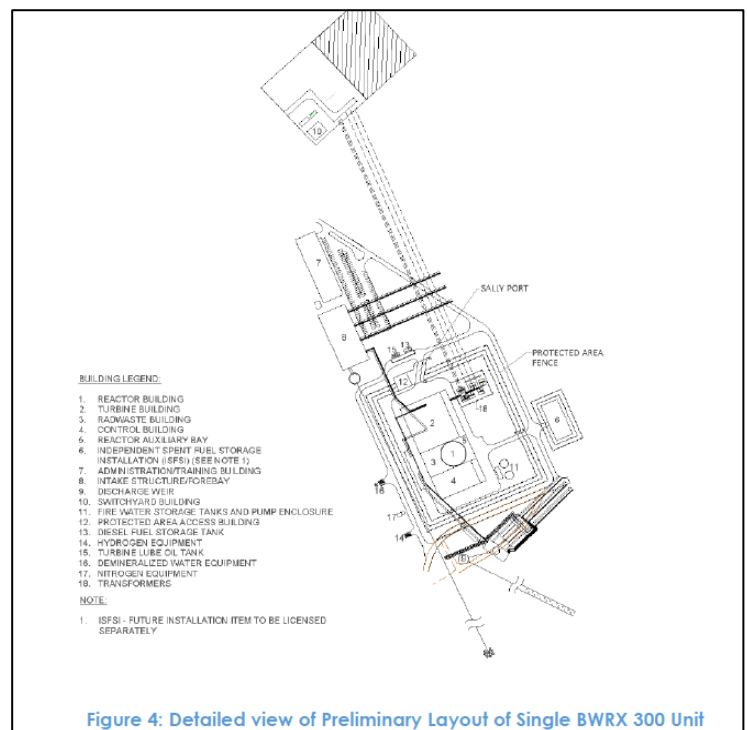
Detailed view of Preliminary Layout of Single BWRX 300 Unit
